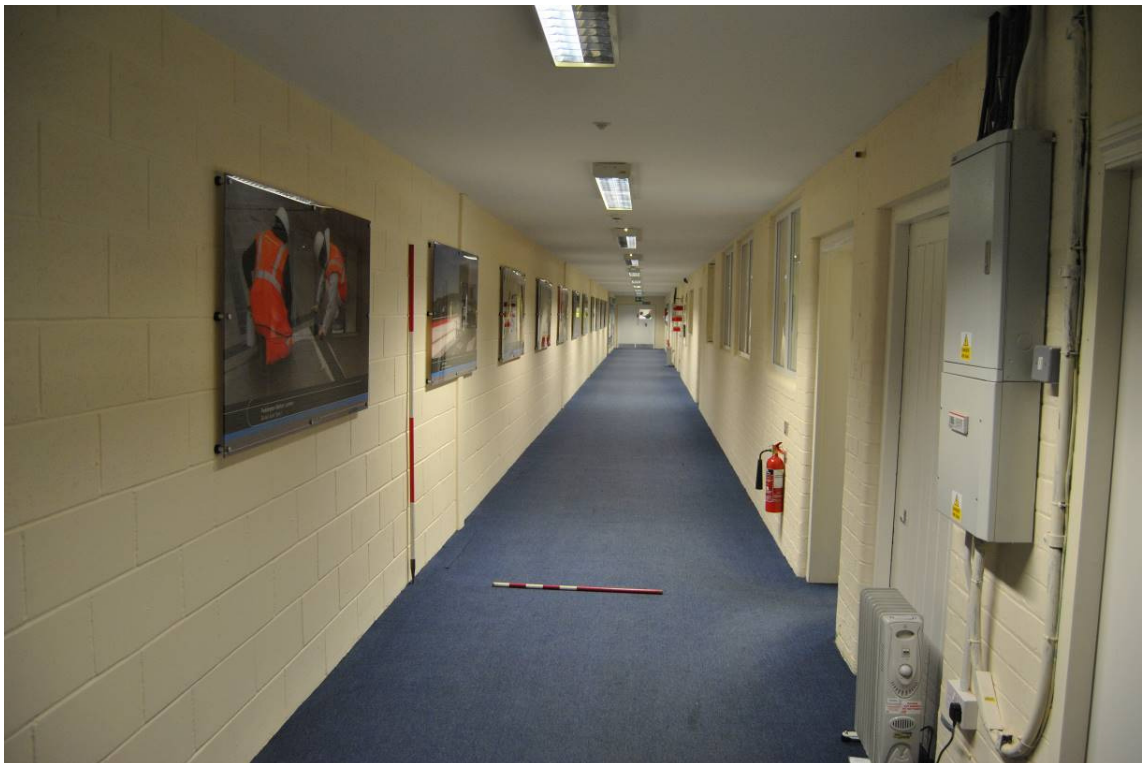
Corridor (B1; Figure 10) formed to east side of print works by insertion of breeze-block wall (left); looking north, primary brickwork wall (1935) to right.
